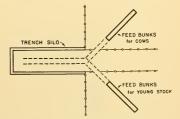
Silage stored in trench silo also can be fed outside in bunks.
